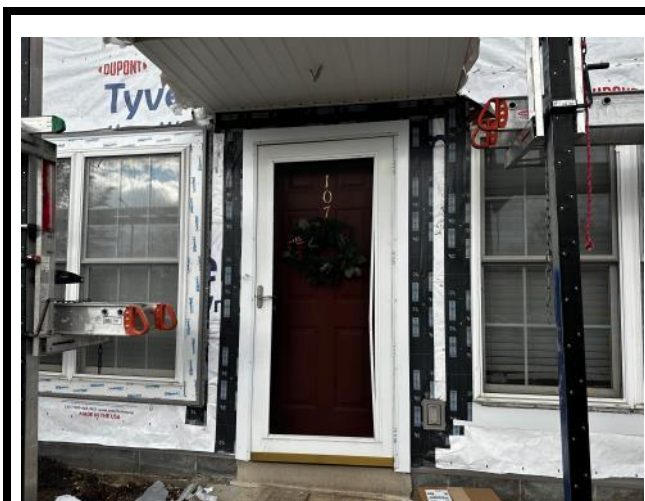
Overview of new flashing tape being installed at a front door and windows.
